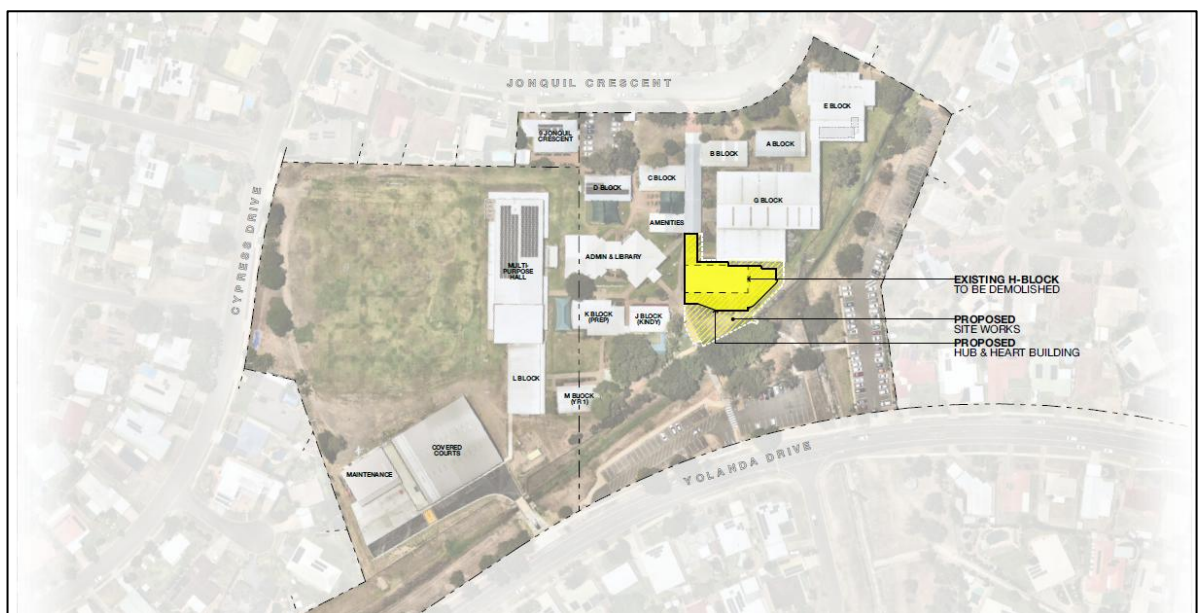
Existing and Proposed Development Locality (Source: Burling Brown)
